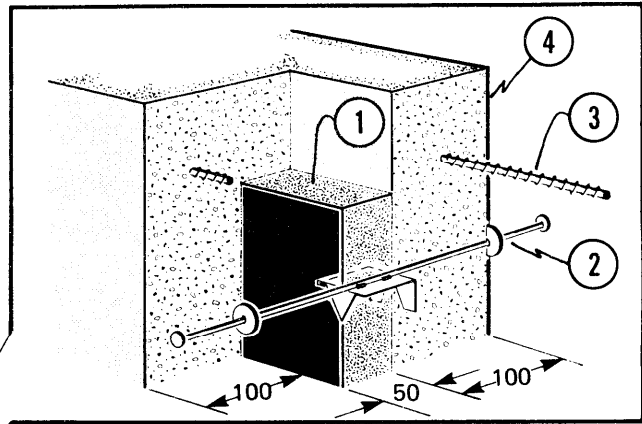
Cast-in-place insulated concrete sandwich foundation for rodent-resistant from buildings. Perimeter insulation 1 is completely encased in reinforce concrete to prevent rodent penetration.
